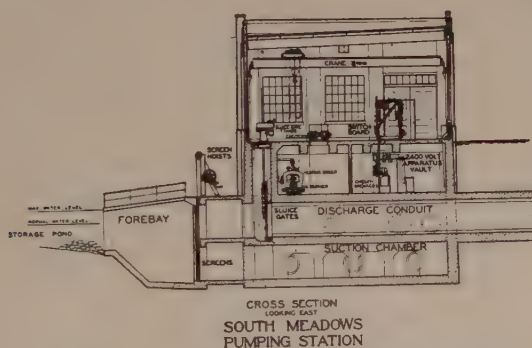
CROSS SECTION OF SOUTH MEADOWS PUMPING STATION, LOOKING EAST
